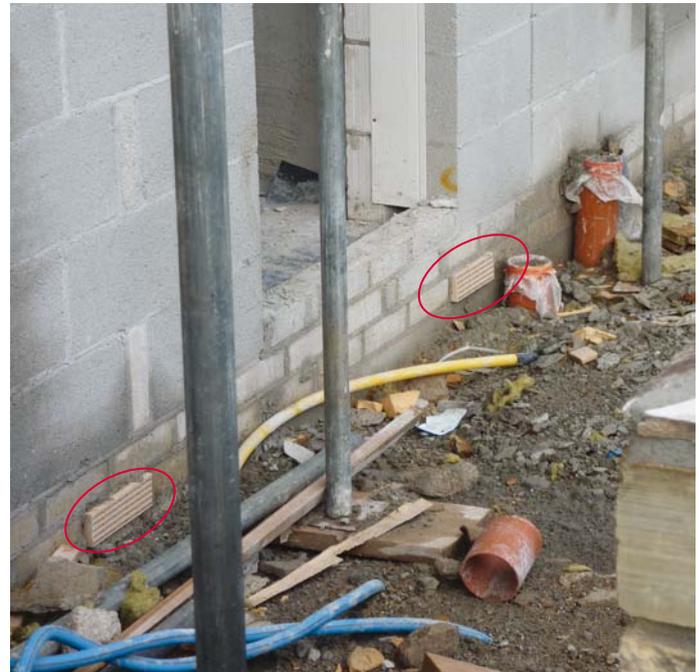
Under-floor ventilation installed in sub-floor void during house construction © Jane Bradley
